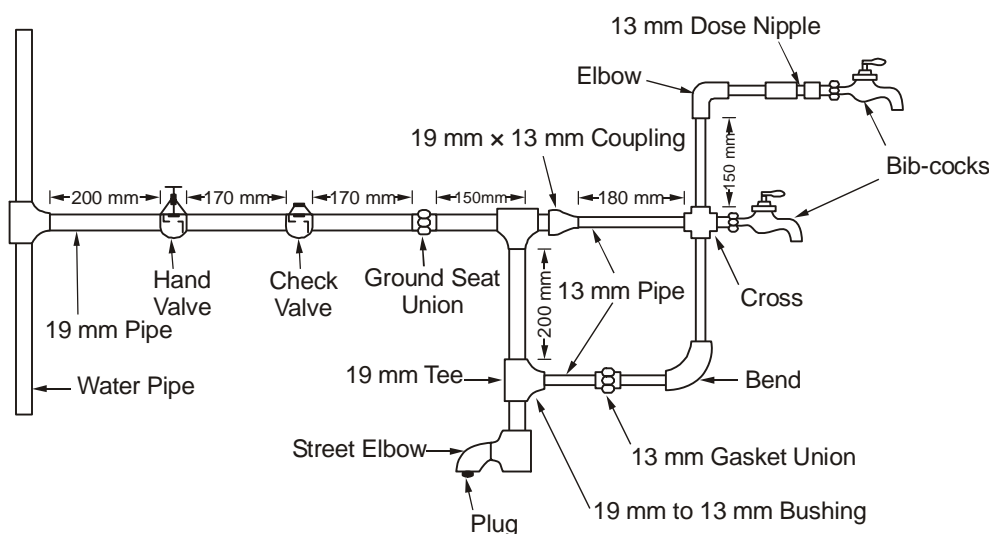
A Piping Assembly Containing the Common Pipe Sizes and the Most Common Fittings
